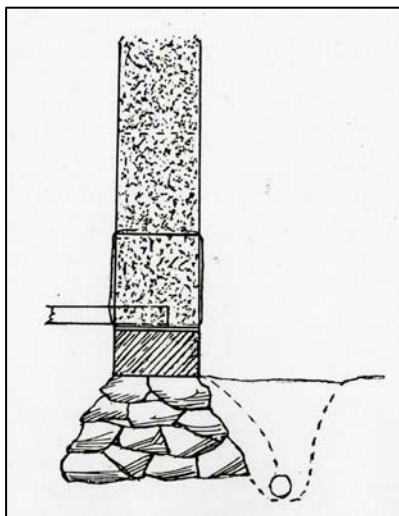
Ellington's sketch of the foundation for pisé buildings. (Image: Karl Ellington)
